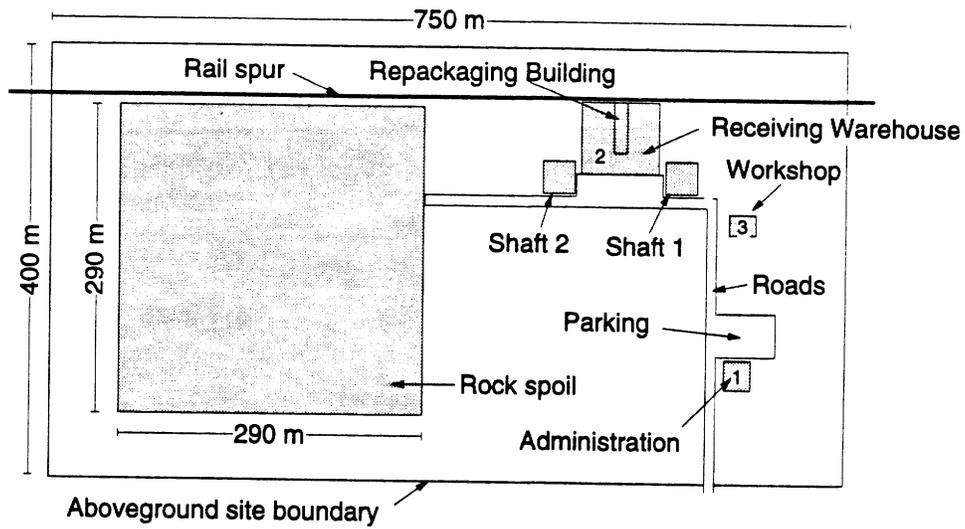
Aboveground Site Layout, UF₆, Mined-Cavity Storage Facility
